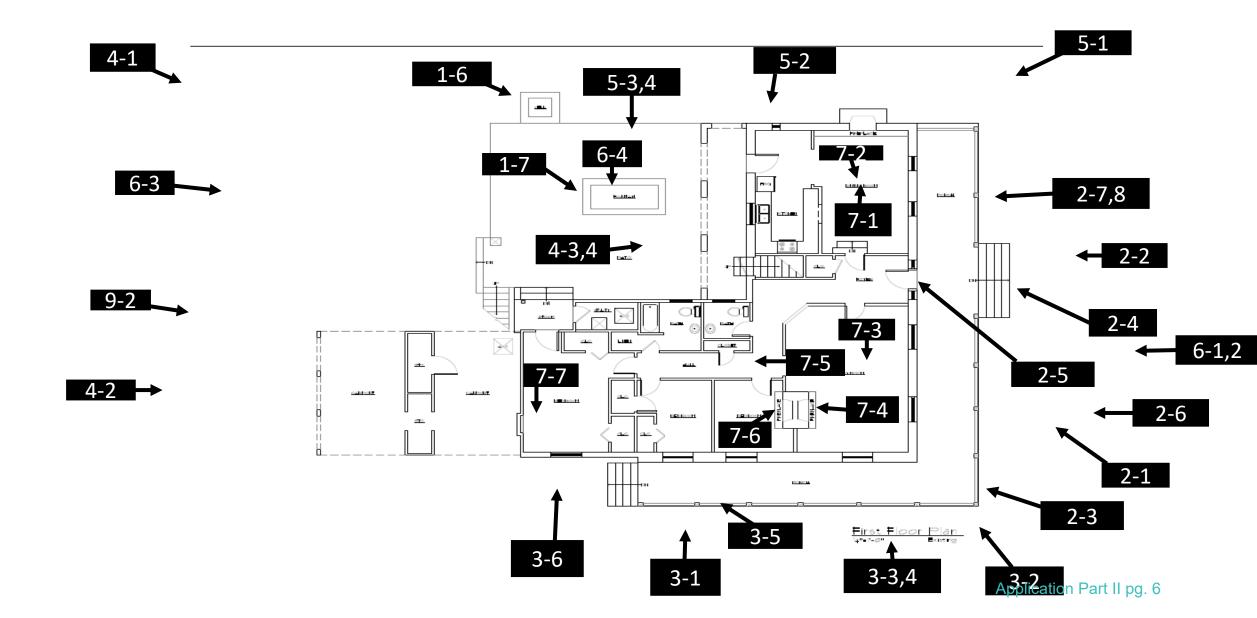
Drawing no. <u>A1, A9-11</u>
